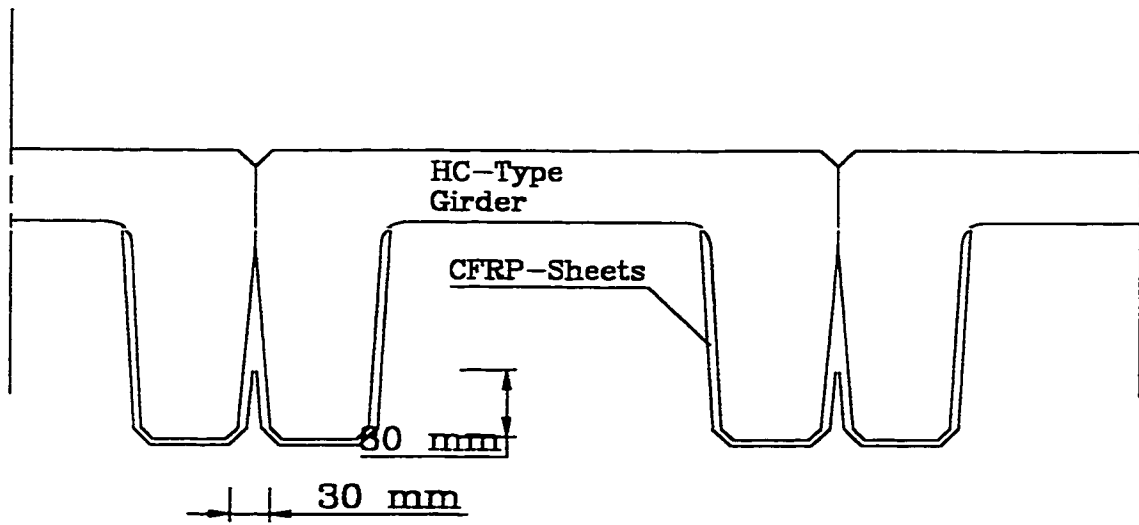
3 The Webs of the Beams in The Bridge Layout
